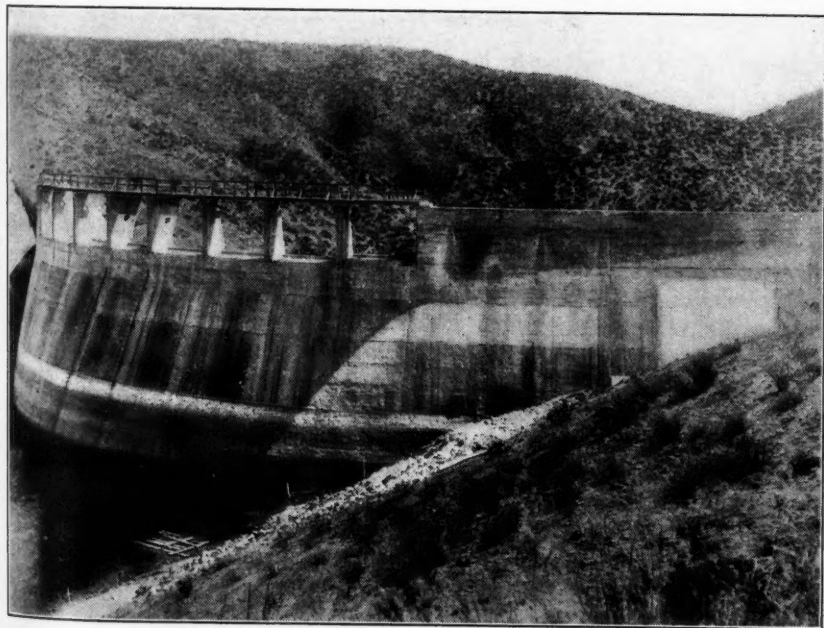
UP-STREAM FACE, RAILROAD CANYON DAM.
